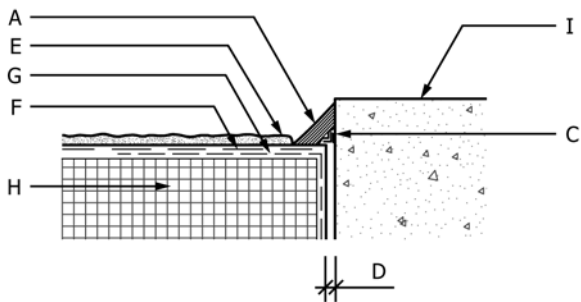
Sealant Fillet Joint Seal With Bond Breaker
